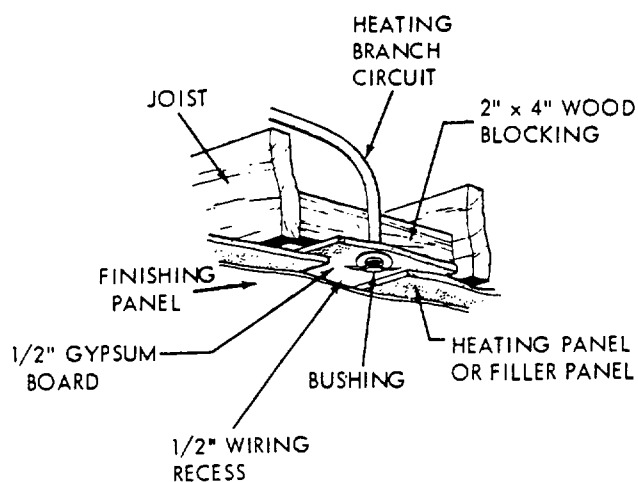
Wiring Recess Construction (1/2" Depth)
